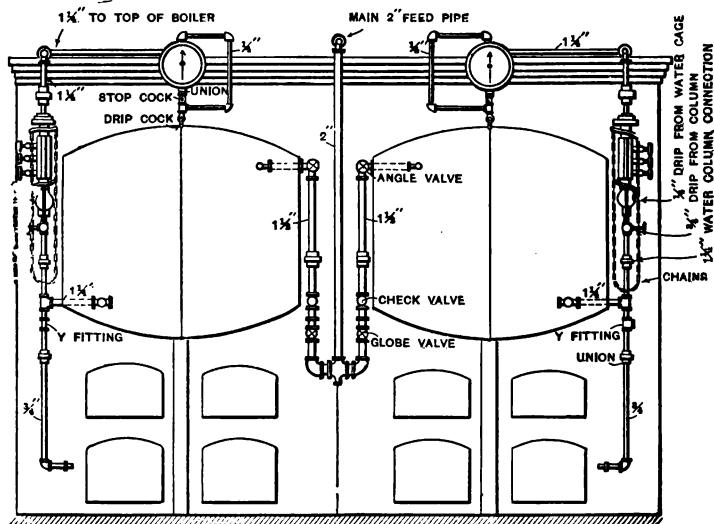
Pair of Horizontal Tubular Boilers with Trimmings
